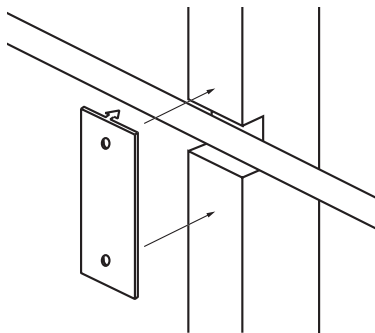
Installing a nail plate to protect wiring in a notched stud.
